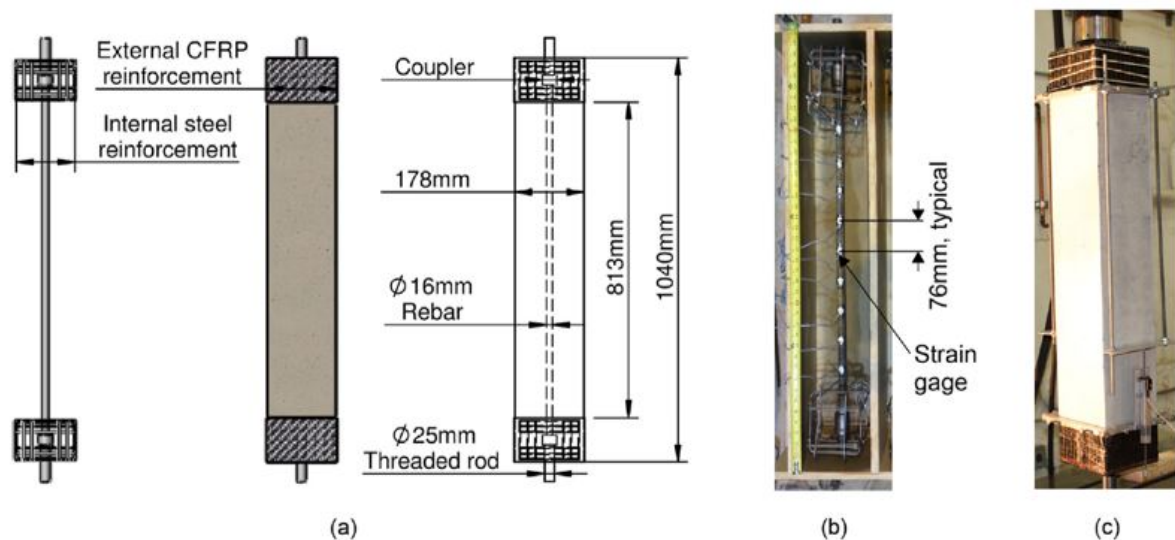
Specimen details: (a) materials and detailing; (b) strain-gauges placed prior to casting; and (c) global view of specimen prior to testing.
